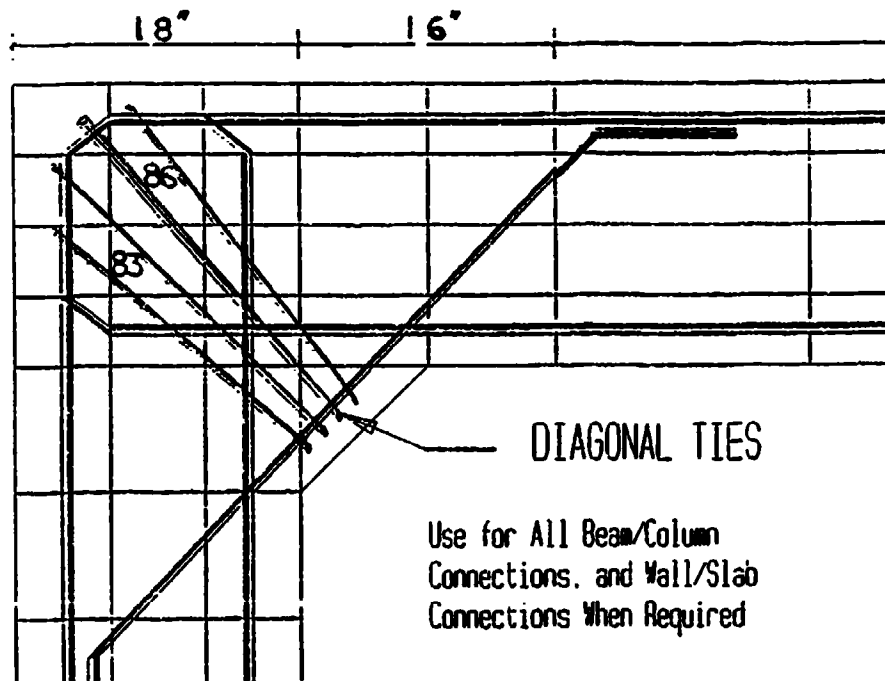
Connection detail with diagonal steel reinforcement crossties.
